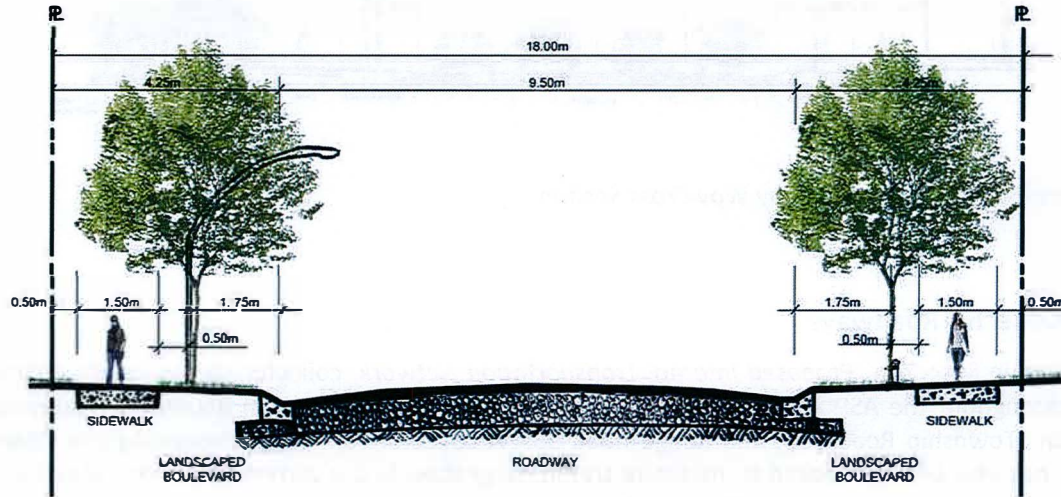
Residential Local Road (Rear Lane Access) Cross Section
